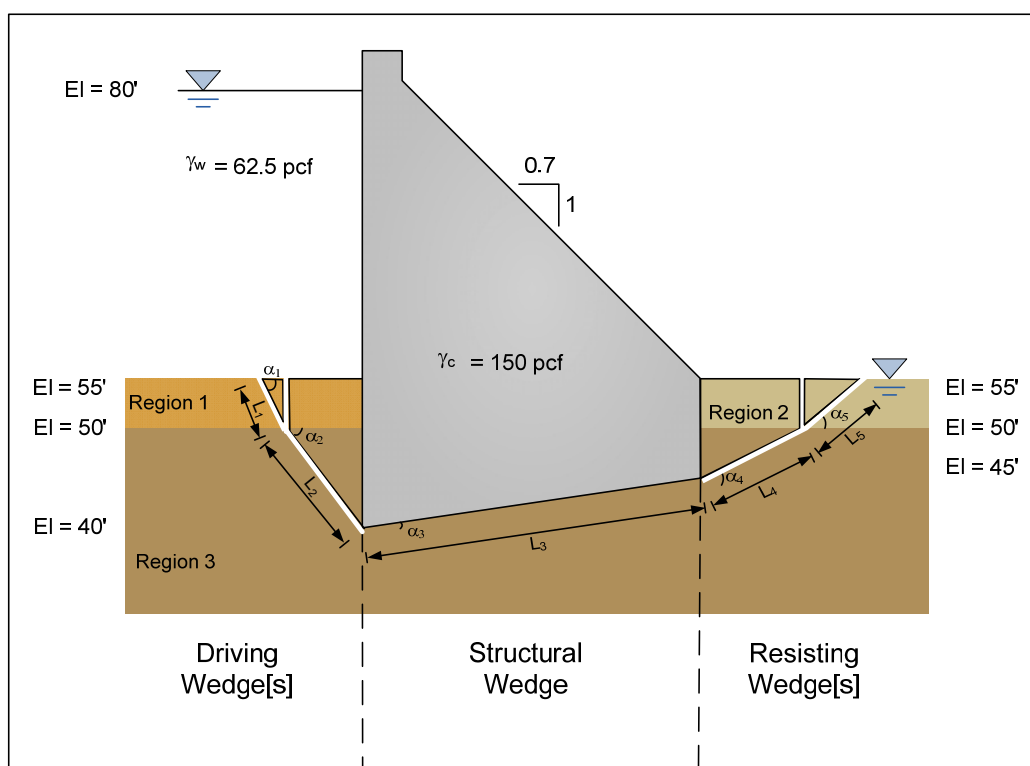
ETL 1110-2-256 hypothetical gravity dam embedded in a rock foundation with no rock foundation drain (Flow Options 5 or 6).
